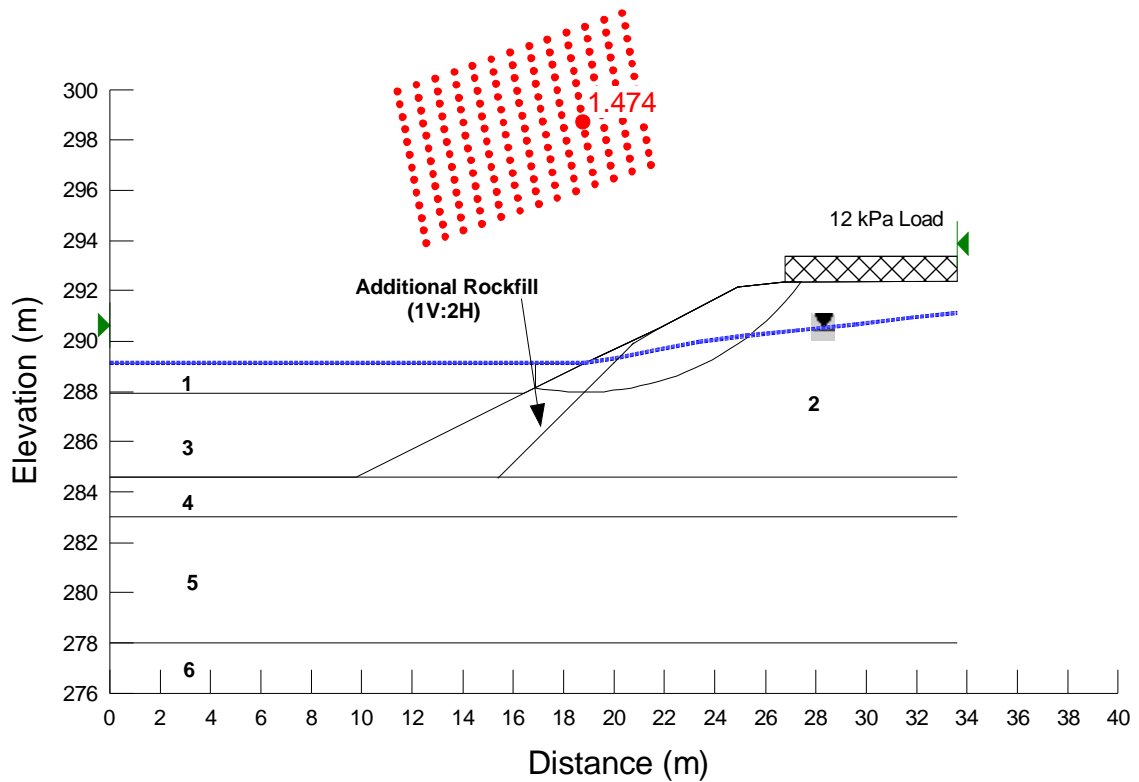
Stability of HWY11 Road Section at Sta. 14+900
